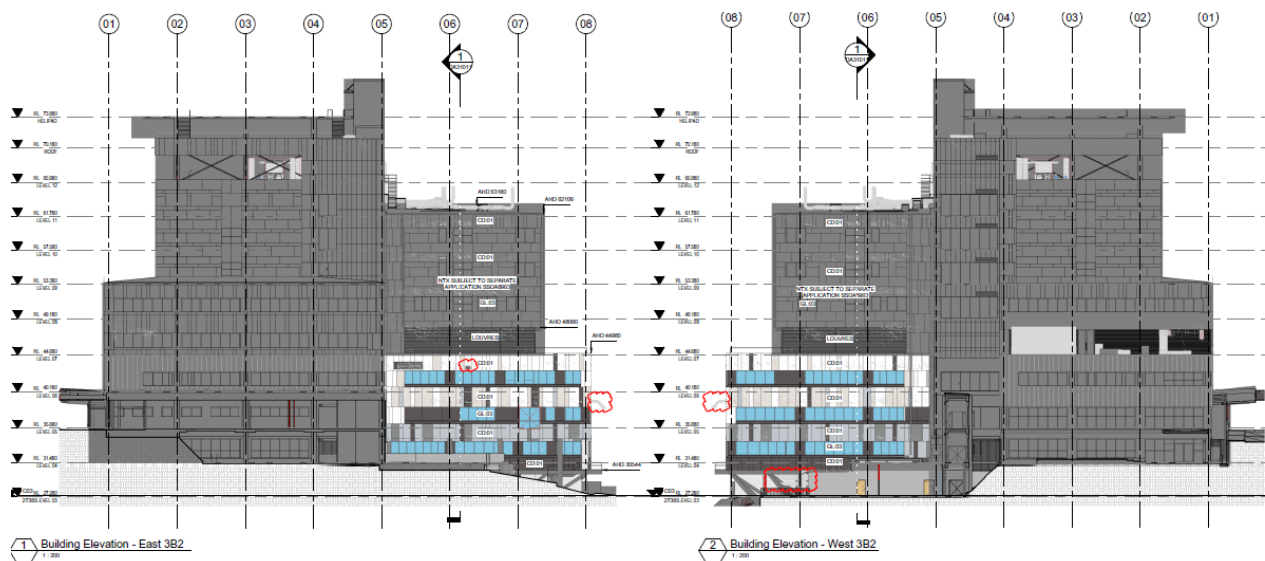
Amended East and West Elevation Plan (Source: CGA)
